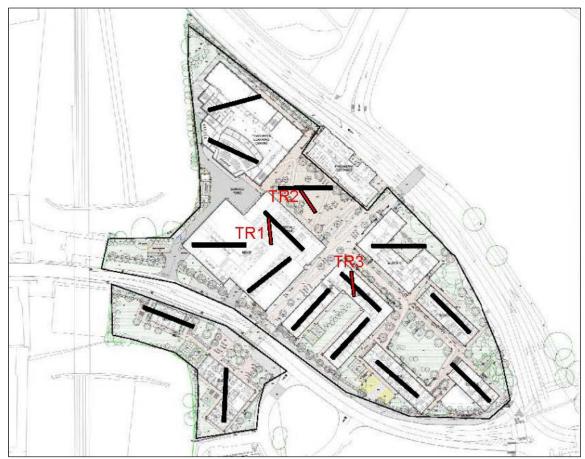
Proposed trench plan (black) and excavated trenches (red) over proposed development.
